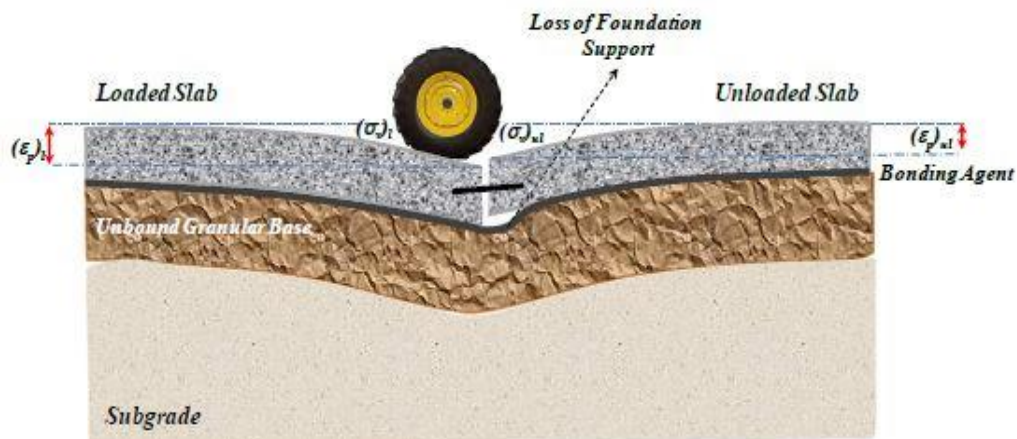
Load Transfer Mechanism in Rigid Pavement [3]
